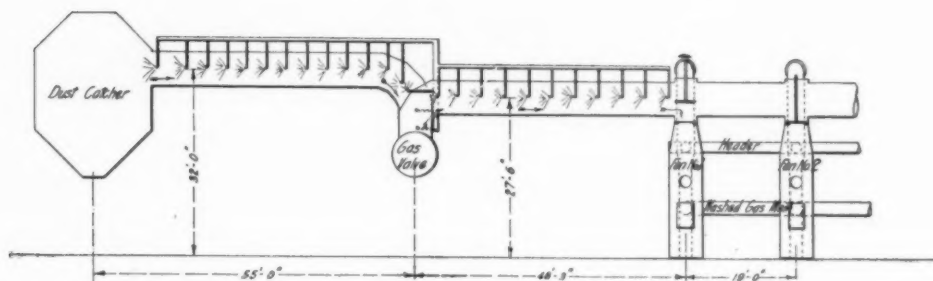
DIAGRAM OF GAS WASHING PLANT FOR
